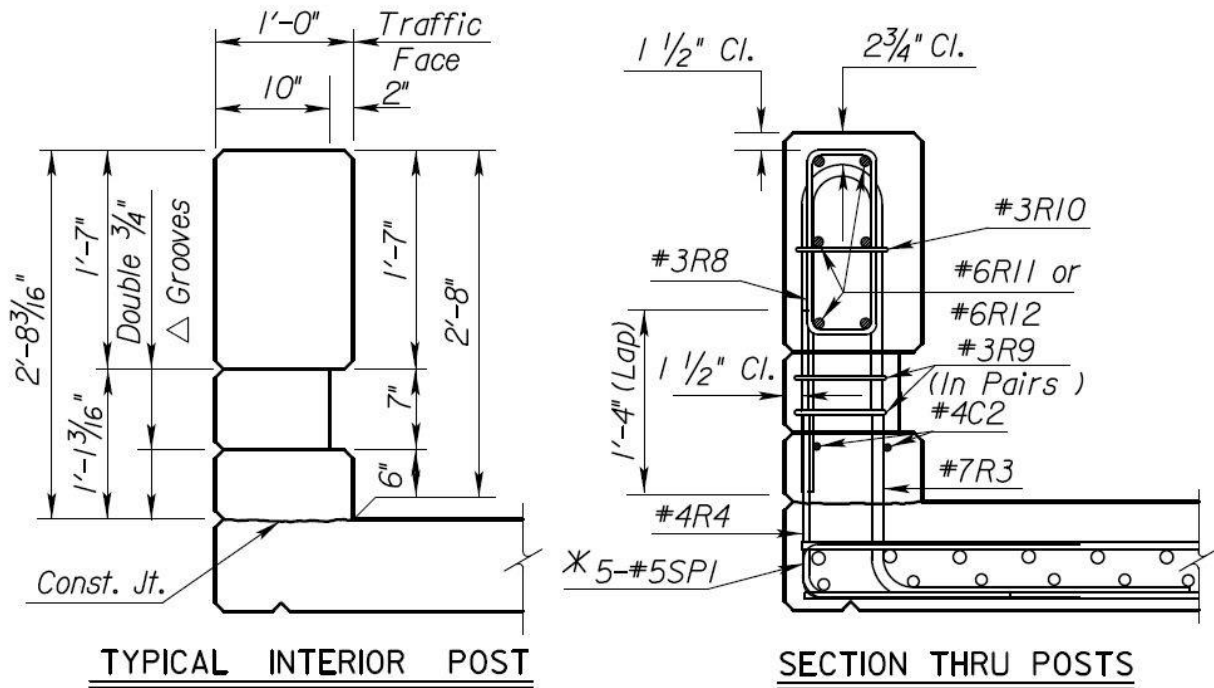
32-in. Tall Corral Rail with a 6-in. Tall Curb Details
